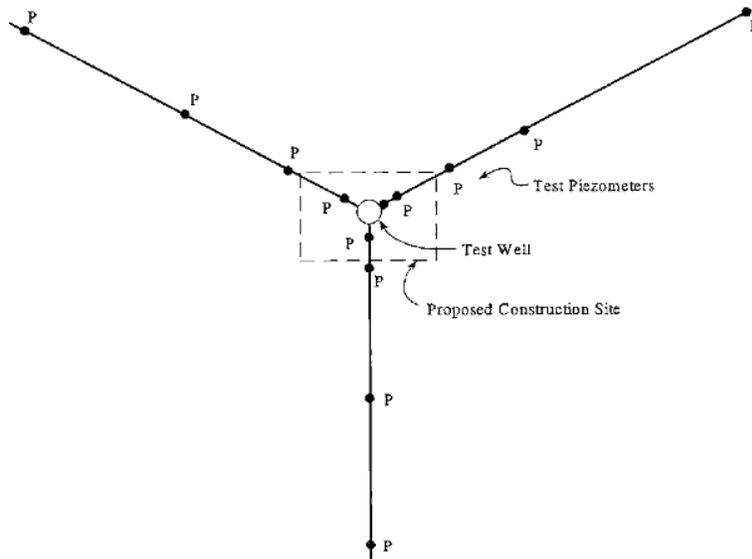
A General Configuration and Layout of Piezometers for a Pumping Test.
